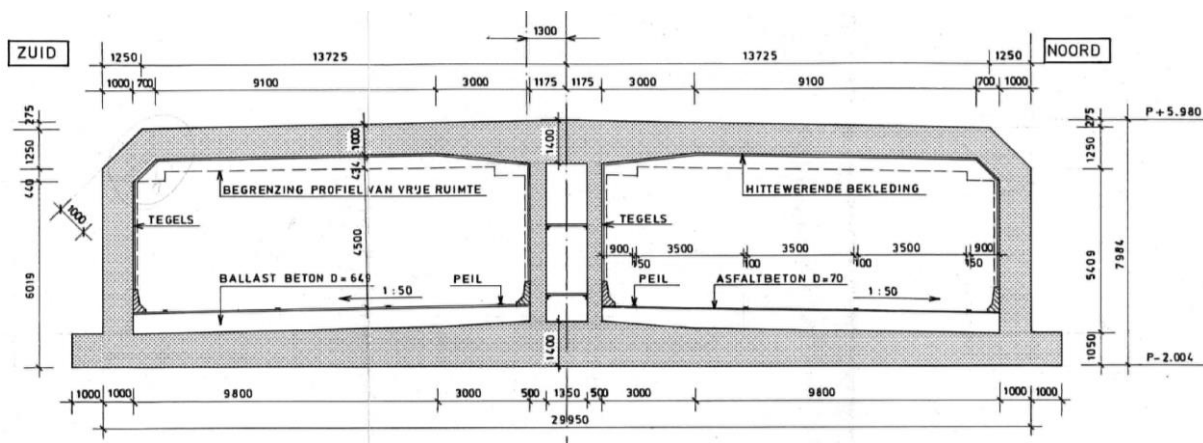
Cross section Noordtunnel (Sweco, 2020).
